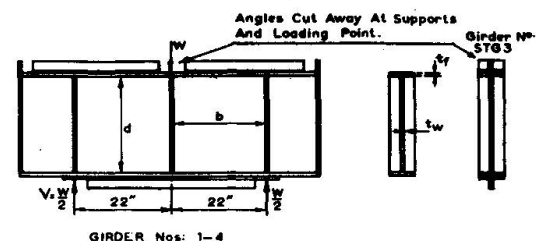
DETAILS OF SERIES III GIRDERS.
